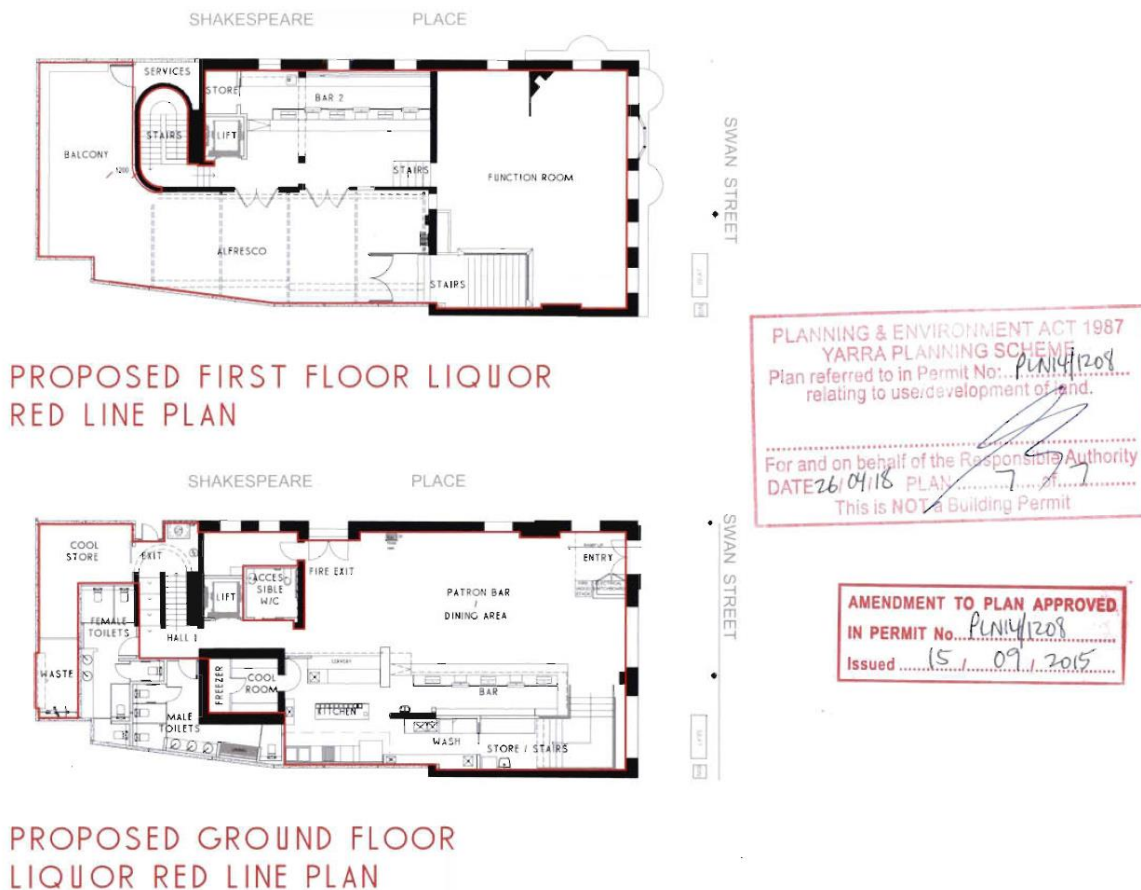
Layout of subject site as shown on endorsed red line (licensed area) plan of planning permit PLN14/1208.
